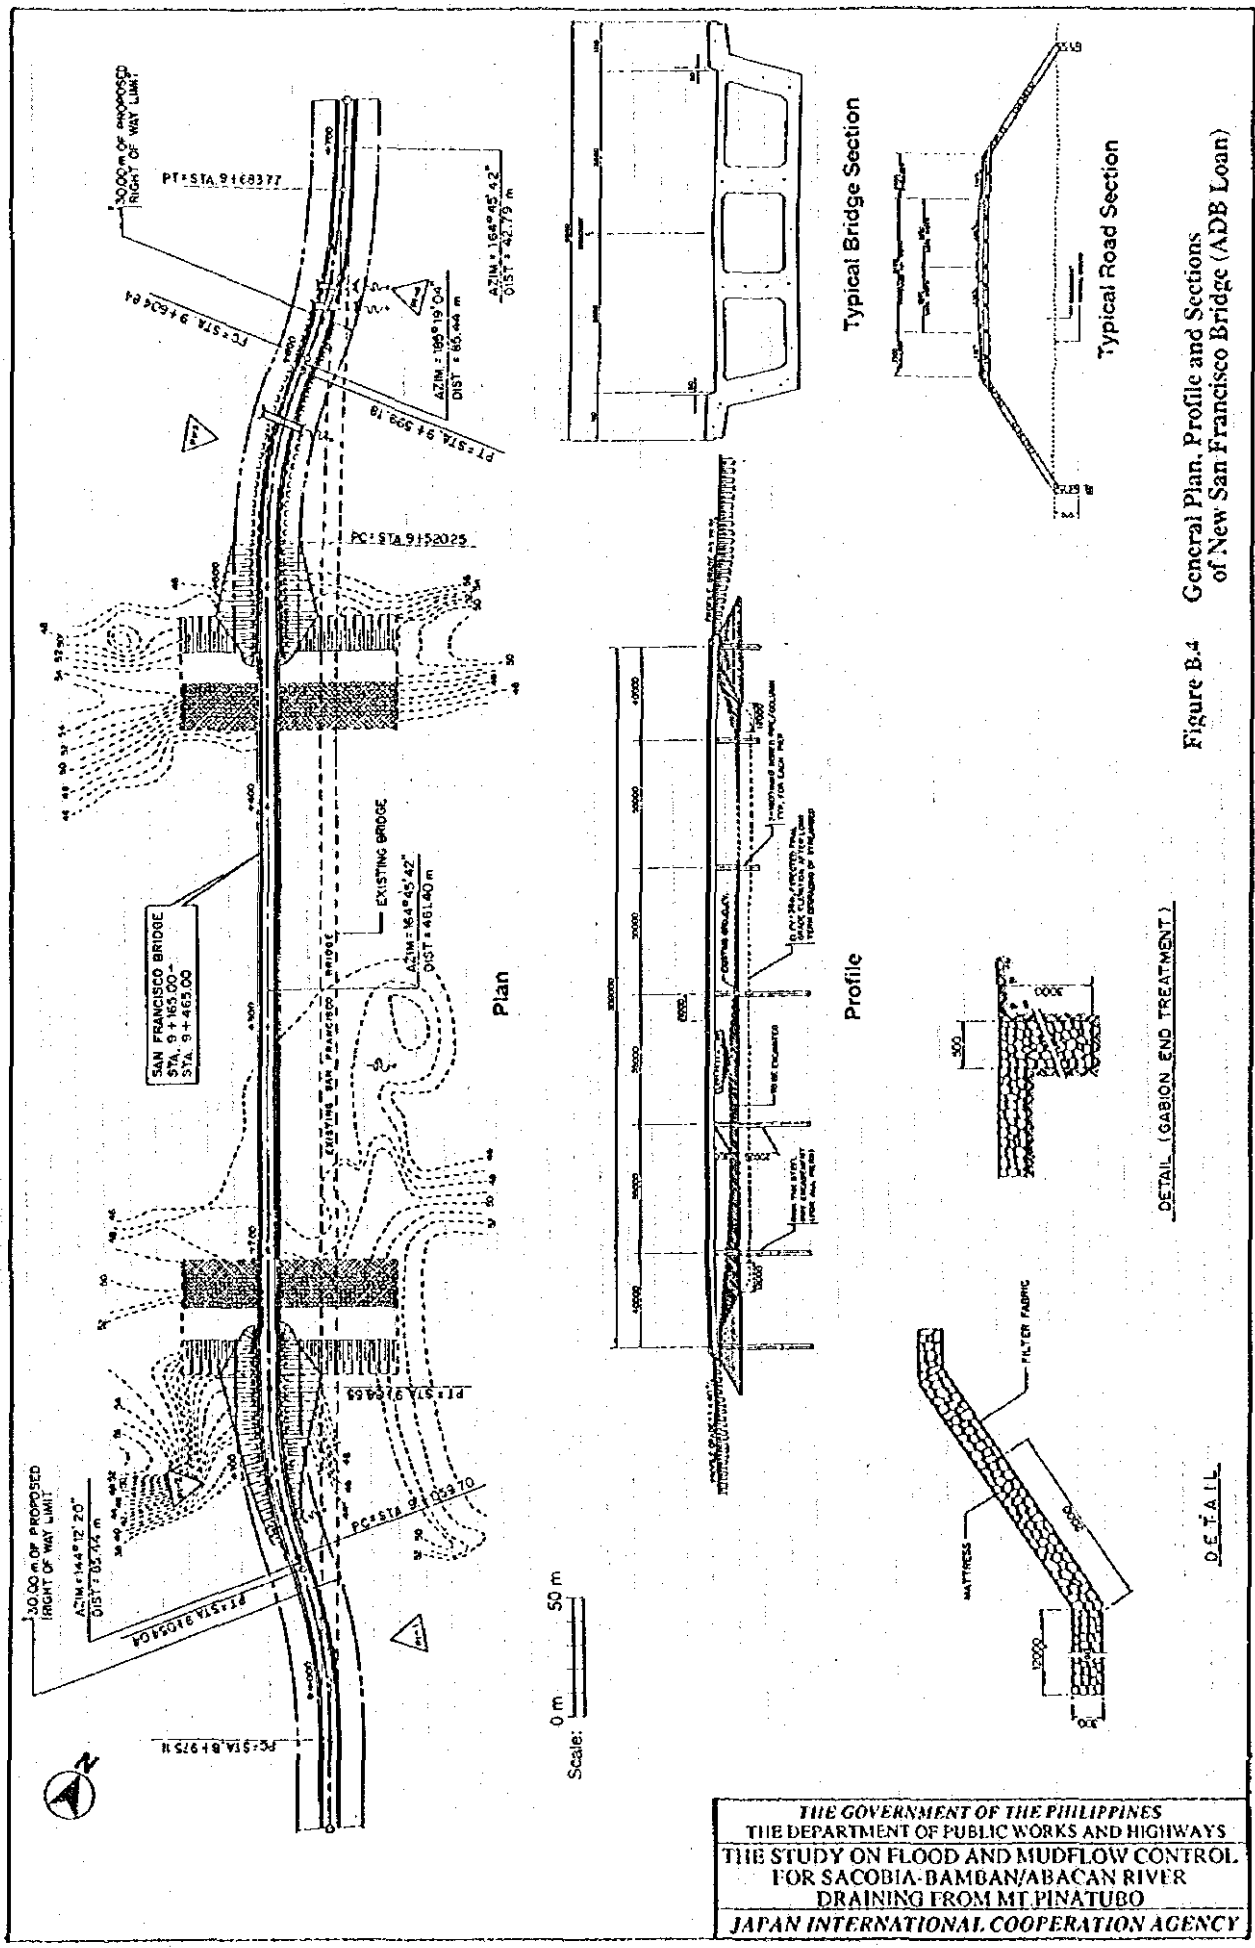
General Plan, Profile and Sections of New San Francisco Bridge (ADB Loan)
